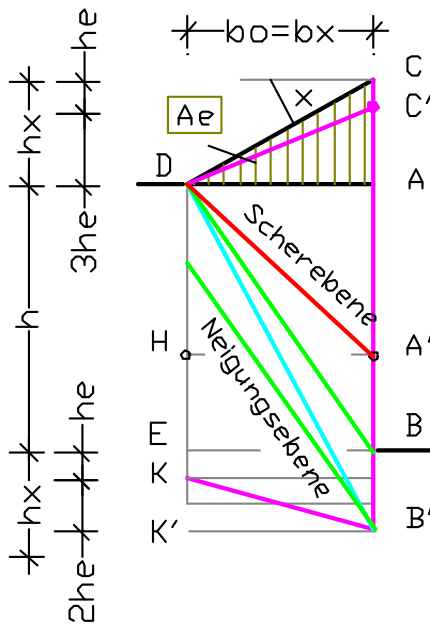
Earth block with falling terrain surface, and inclination & shear planes under load.
